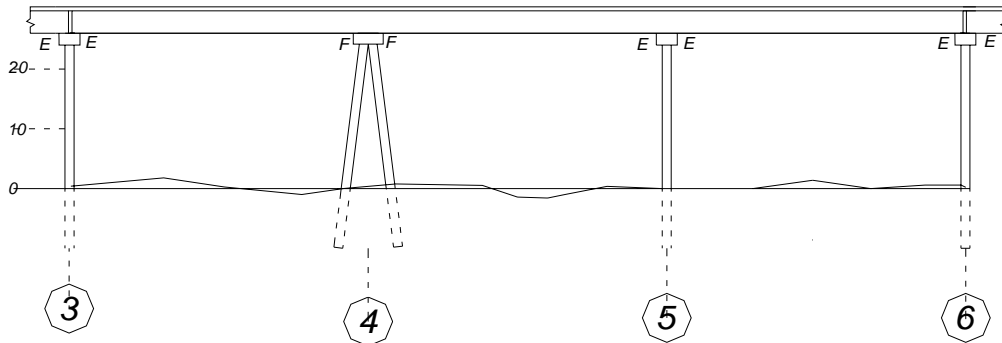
Bridge elevation showing typical three-span segment considered in this study.
